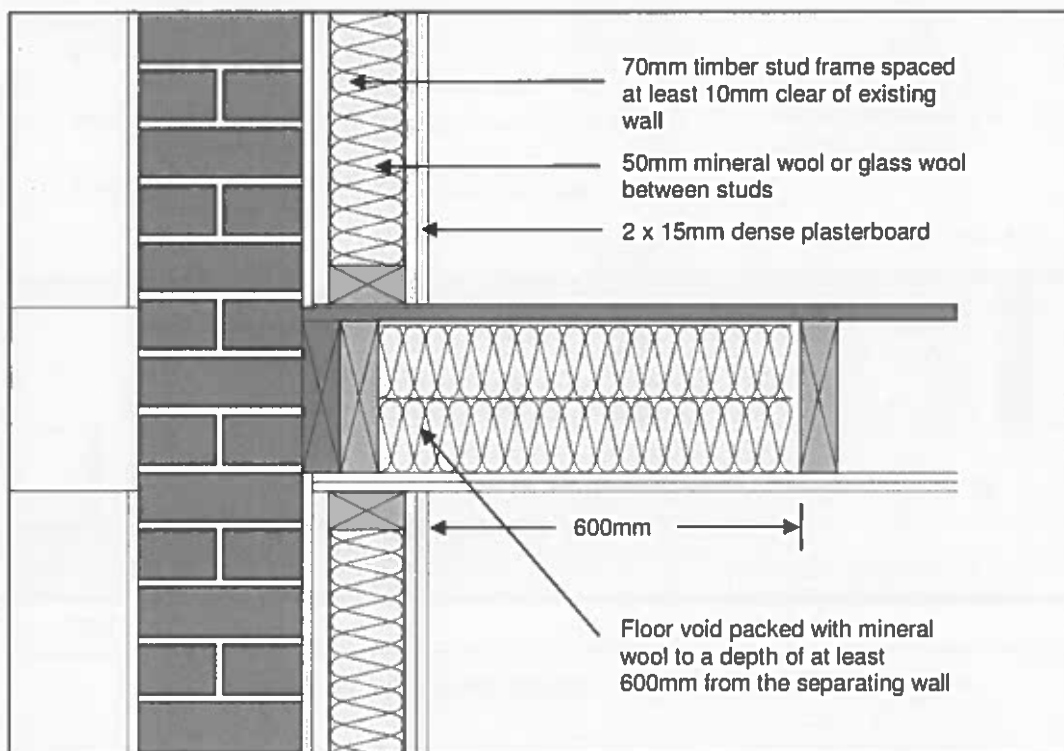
Junction between separating wall lining and stairwell floor (Section)
